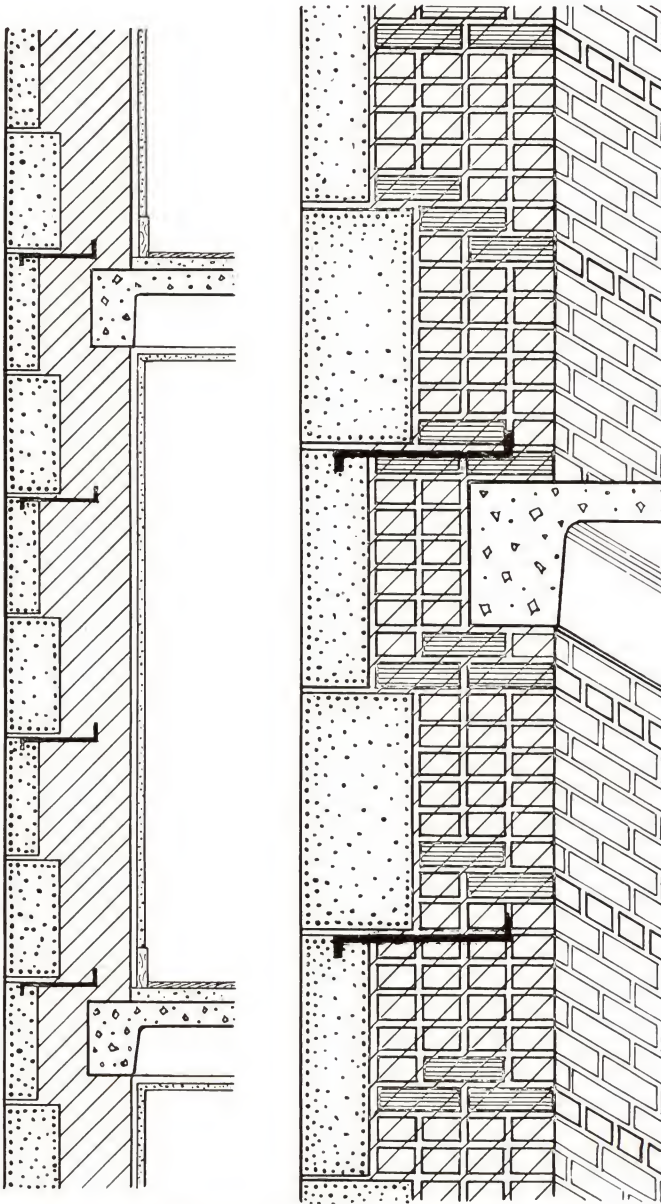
Section of load-bearing wall showing stone facing bonded and anchored to brick backing.
